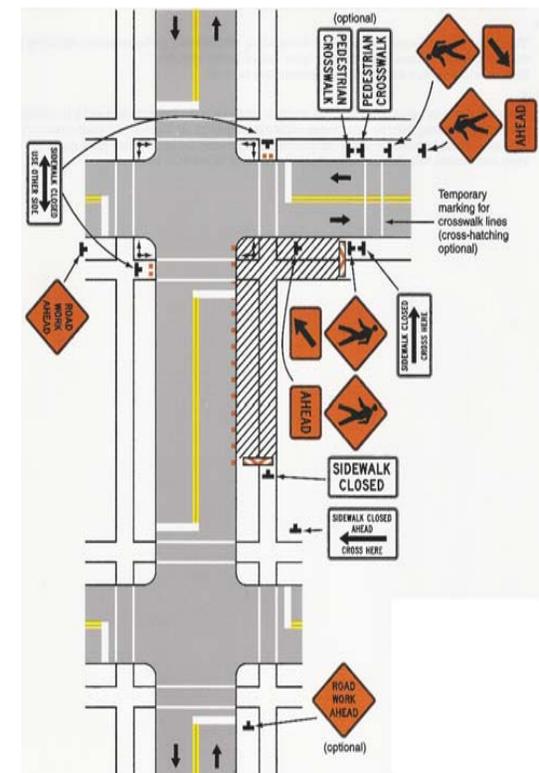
Adapted from Sample Signage Plan for Temporary Pedestrian Closure (MUTCD, Figure 6H - 29).
